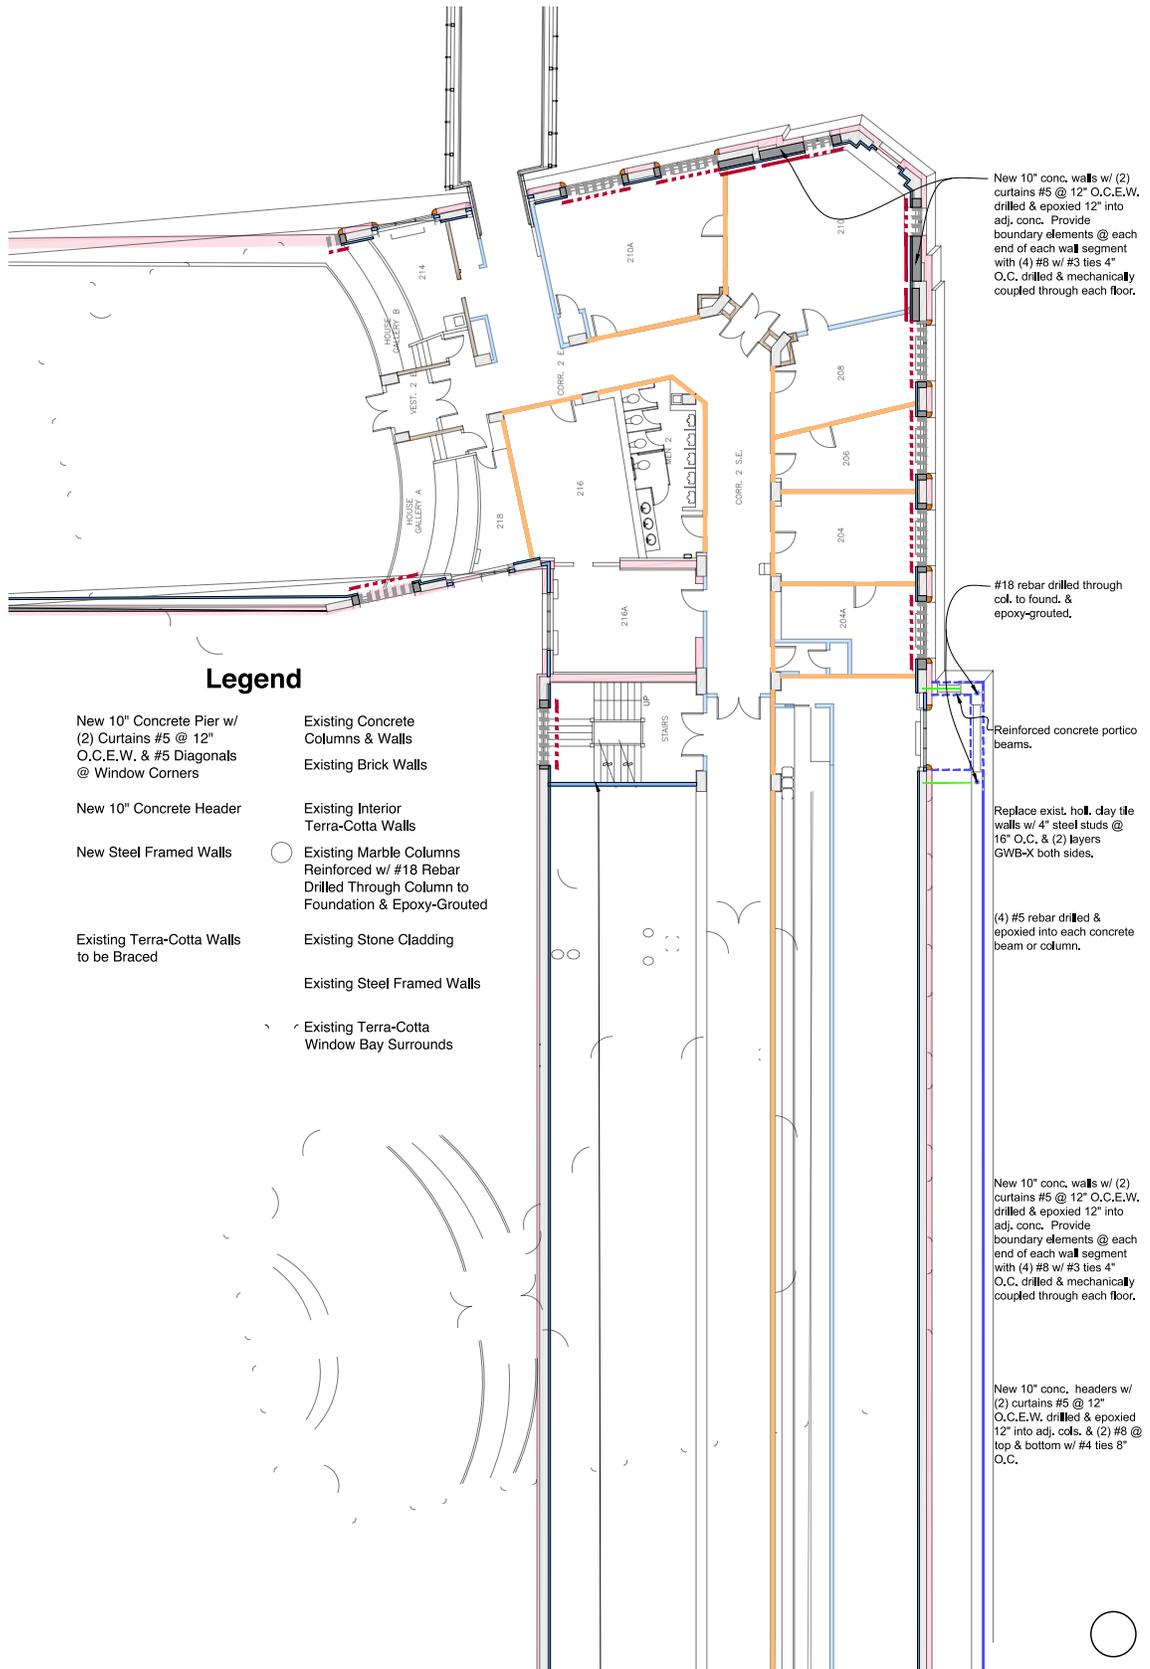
(3): Structural Reinforcing of Building Frame - Floor Level 2
